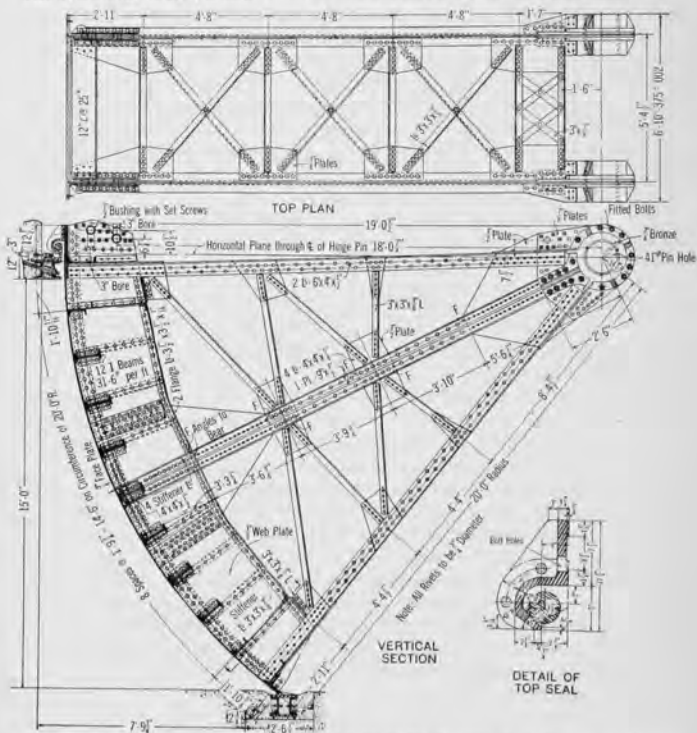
WELLAND SHIP CANAL: DETAILS OF 7 BY 15-FT. TAISTOR GATE VALVES FOR LOCKS.
